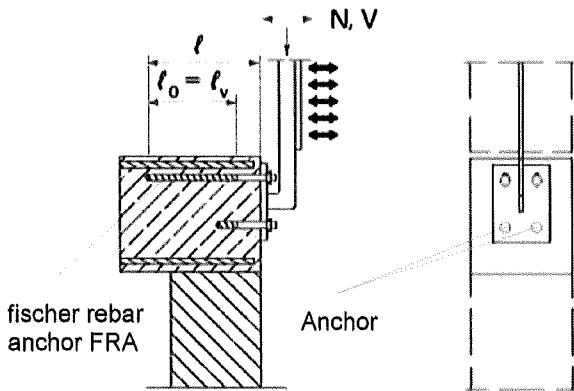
Lap of the anchoring of guardrail posts. In the anchor plate, the drill holes for the rebar anchors have to be designed as elongated holes with axial direction to the shear force.
